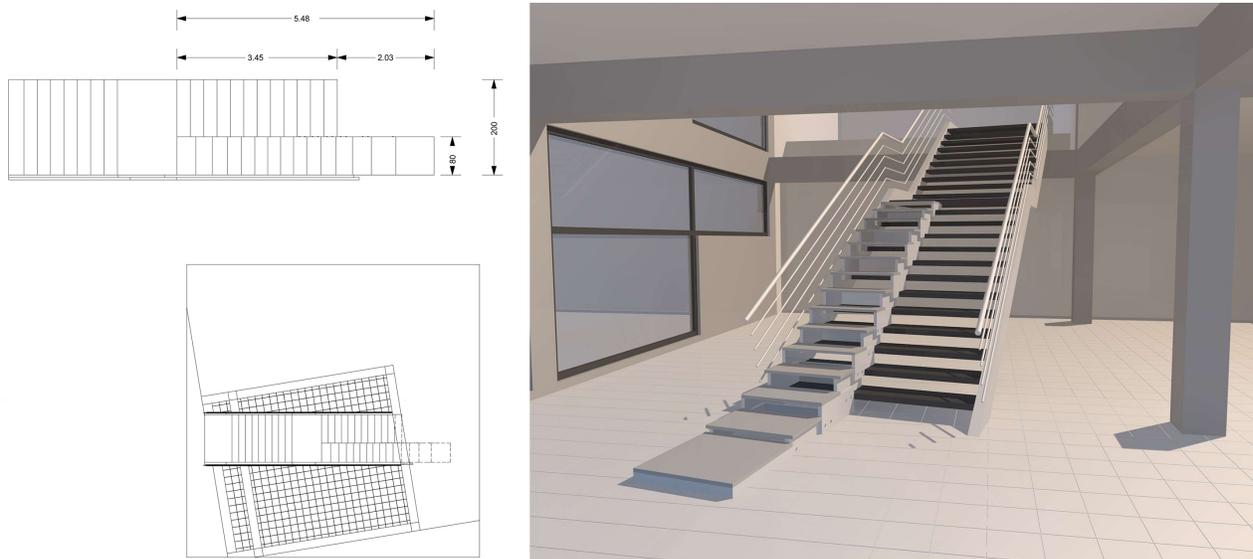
Concept with ground plan and rendering of the walkable sinus stair.
